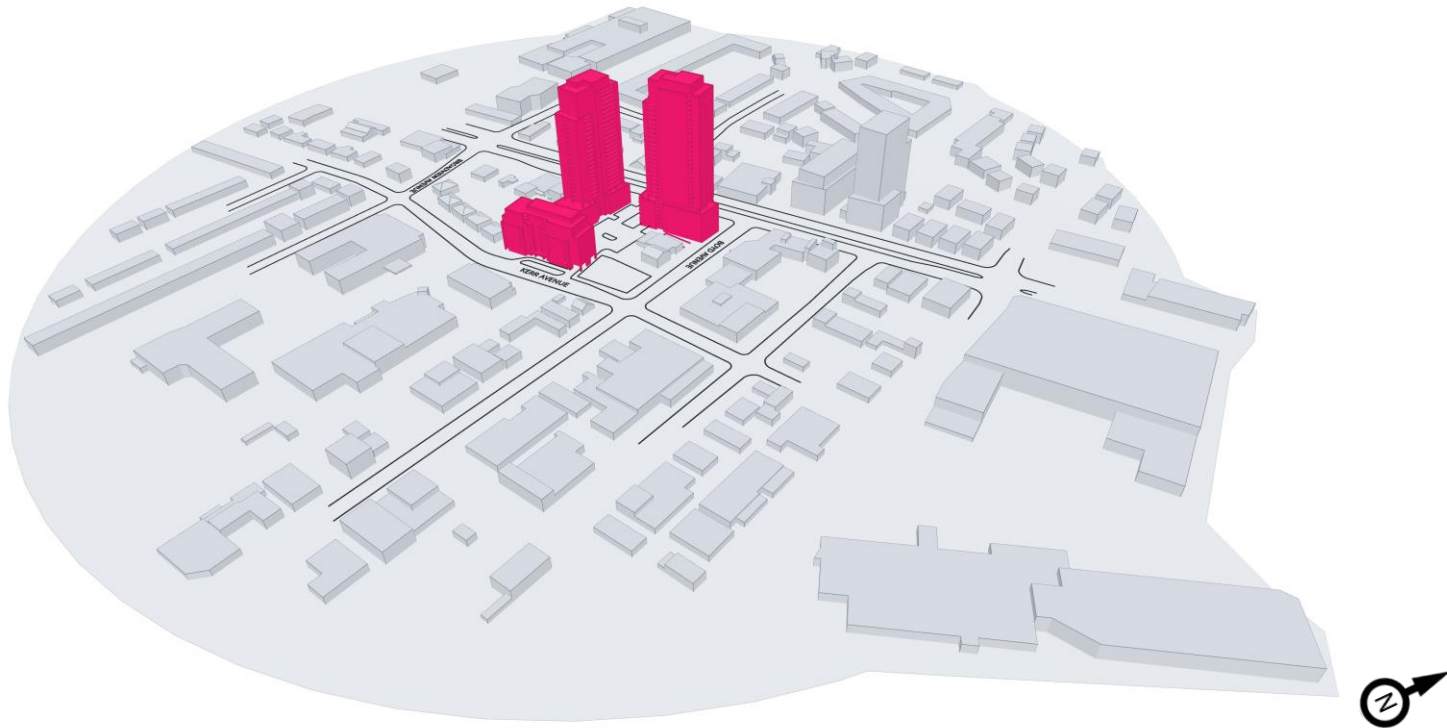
Computer Model of the Proposed Towers and Existing Surroundings
